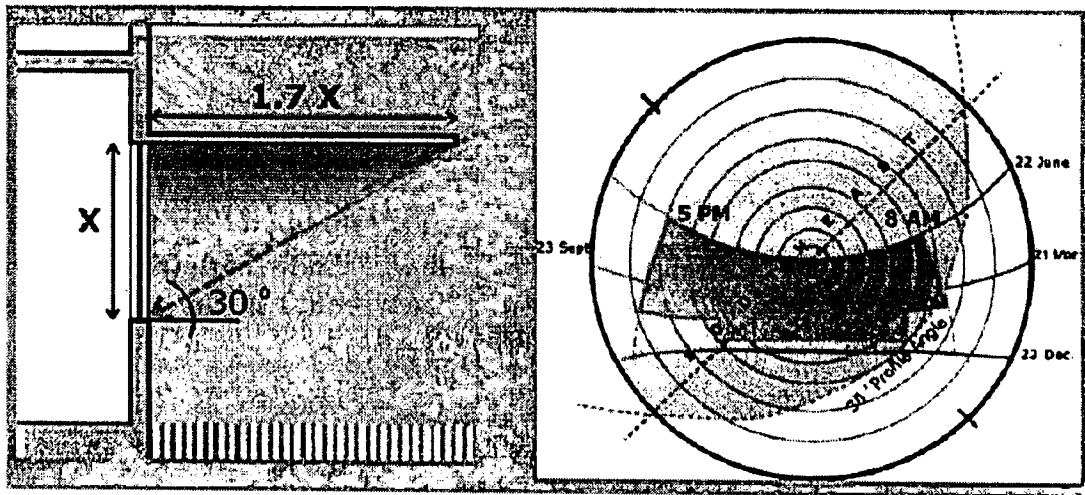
Overhang with 30-degree cut-off angle will shade southeast window from 8AM to 5 PM from March to September. It will not provide shade for a couple of hours in the morning during winter.
